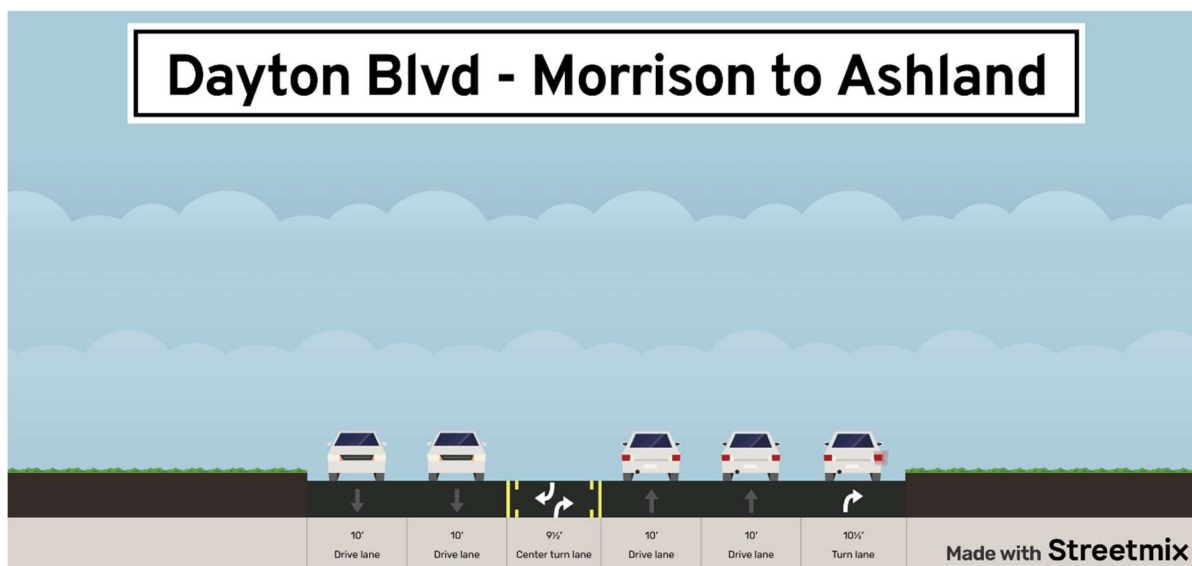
Proposed Typical Section – Dayton Blvd between Morrison Springs Road and Ashland Terrace
